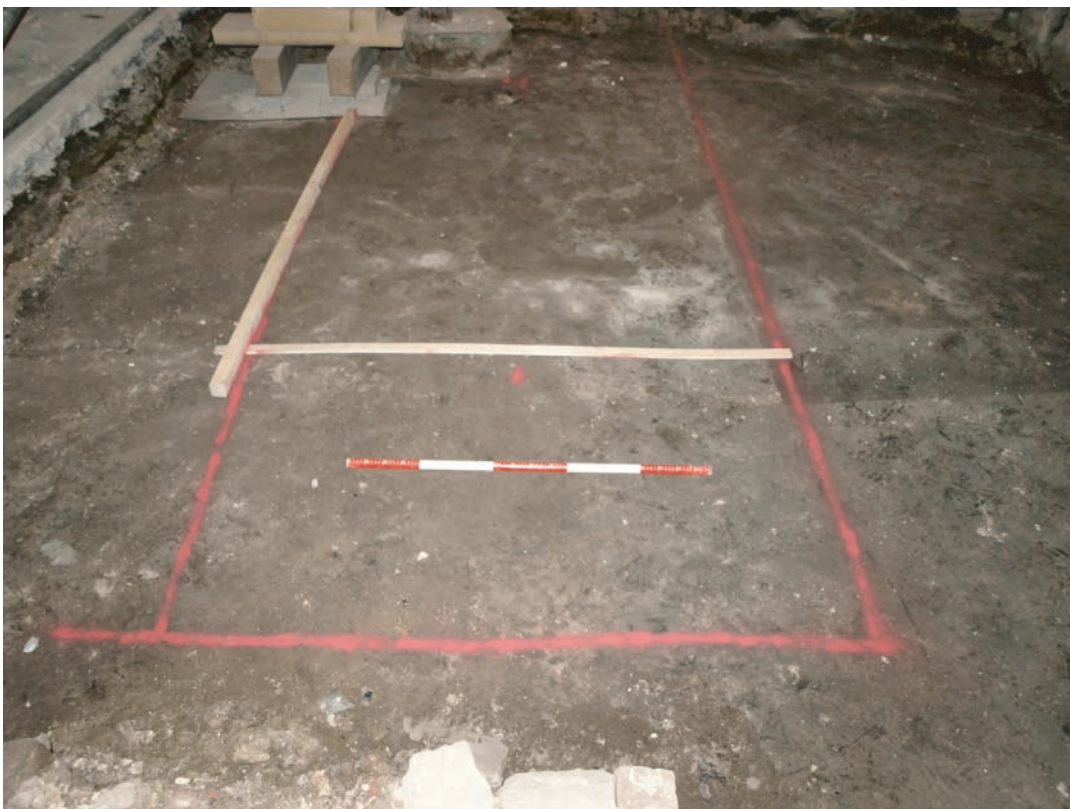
Llanelly House - The Great Hall (Room G1). Marked outline of proposed trench for concrete support base in centre of Room G1. Looking east.
